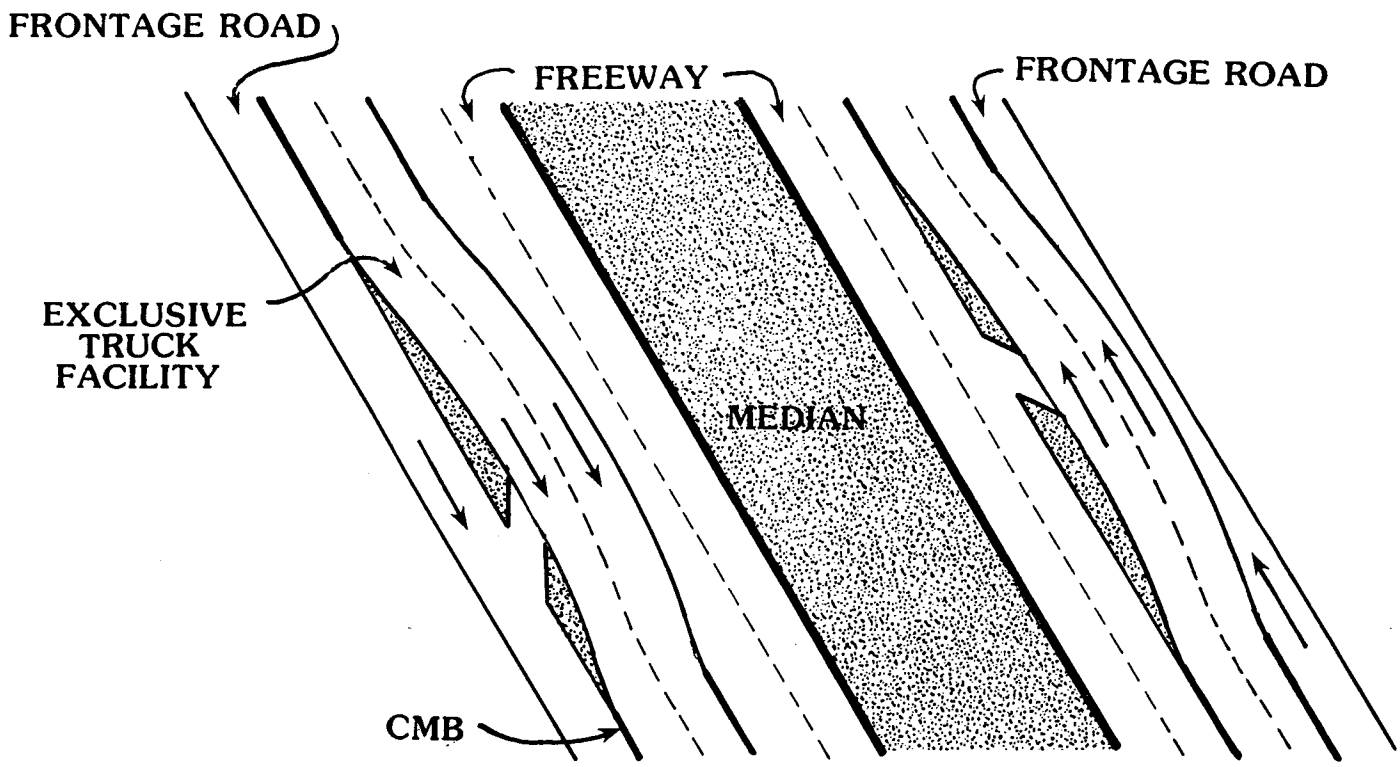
Proposed One-way, One-lane Frontage Road with Exclusive Truck Facility
